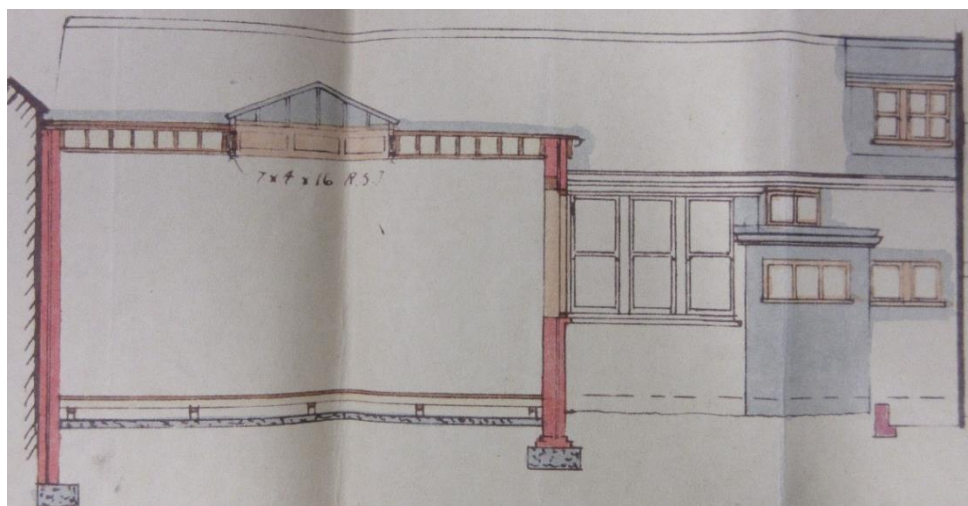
1935 proposed section AA through today's no. 26A, and rear (west) elevation of today's no. 26.
